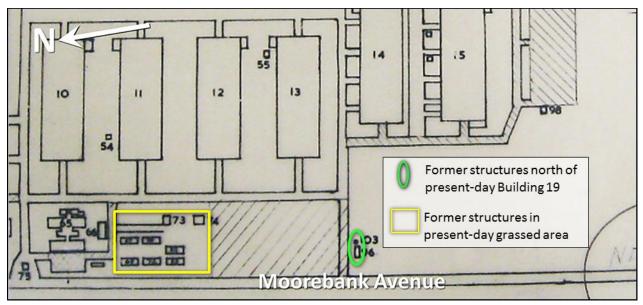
1967 plan of Stage 1A area (detail from plan of proposed East Hills railway line, National Archives C4177/FOLDER64).
